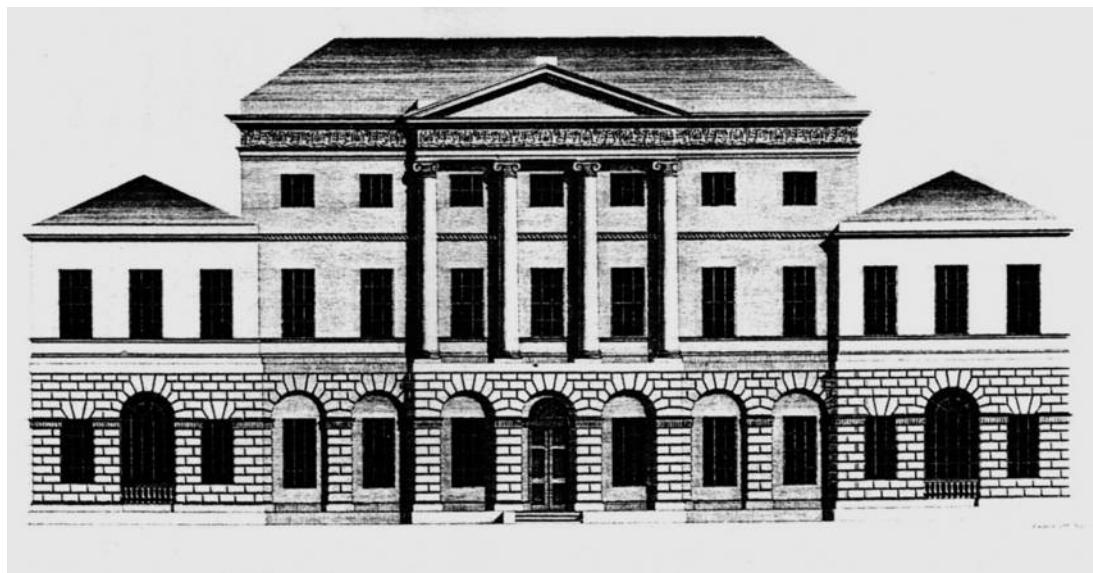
Lansdowne House, London, elevation by Robert Adam.
